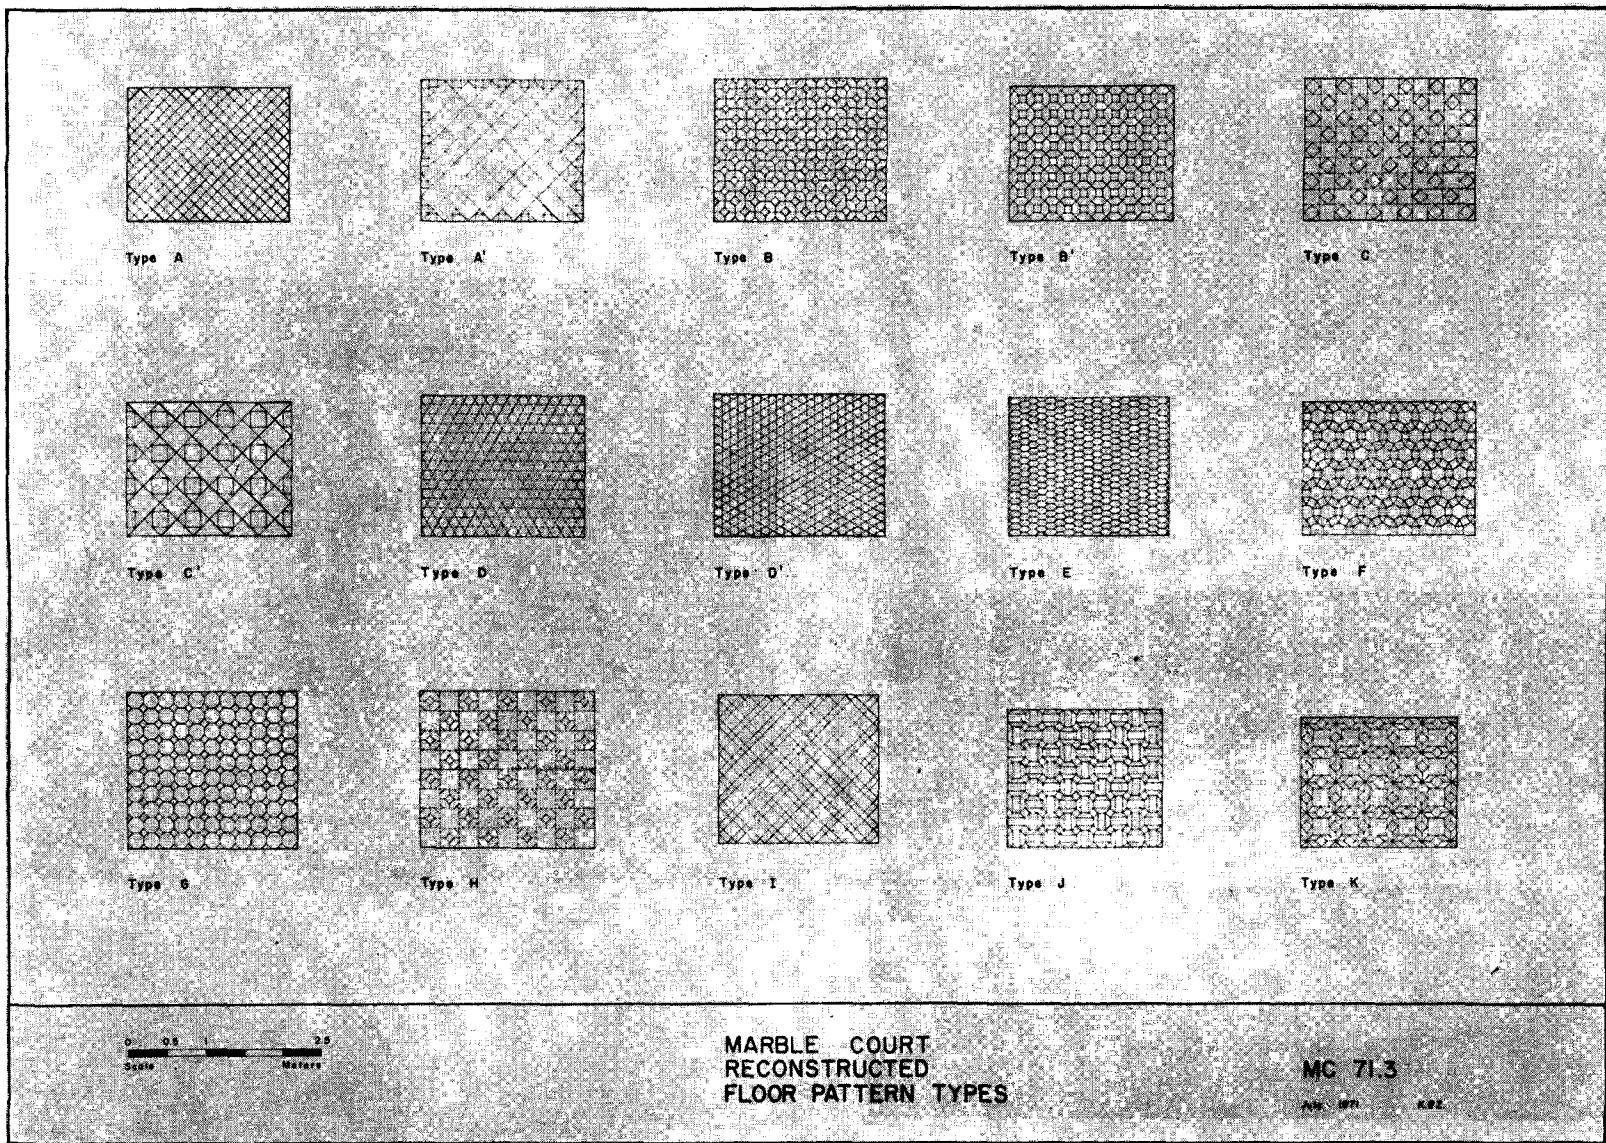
Marble Court Floor. Reconstructed Floor Pattern Types. Drawing by K. P. Zygas.
